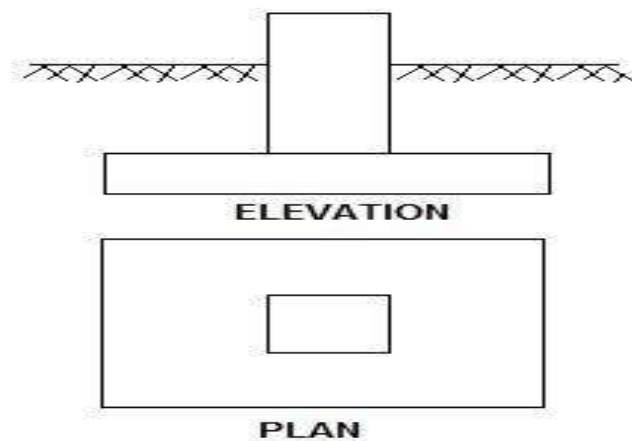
Isolated Footing (Types of shallow foundations, n.d.)
